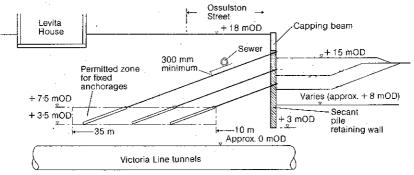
Section showing ground anchors above Victoria Line tunnels
